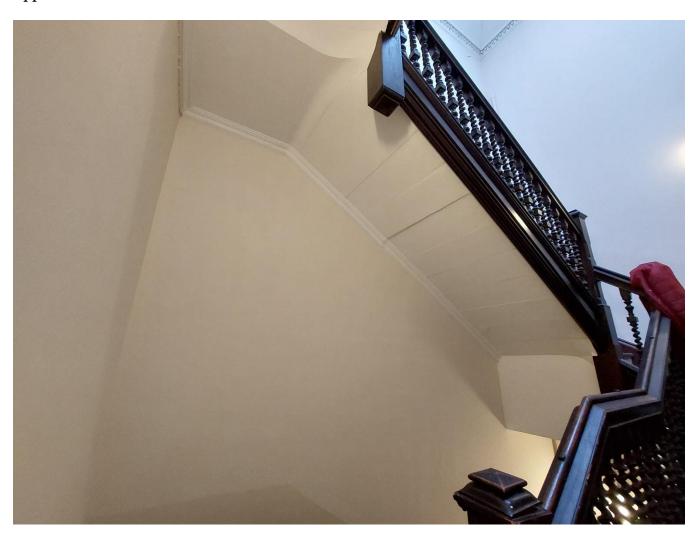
No cracking present to first floor wall and no reoccurring cracking to stone stair treads
